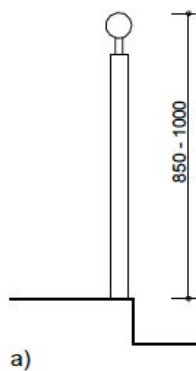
Handrail detail (Department of Public Works, 2001:21)
